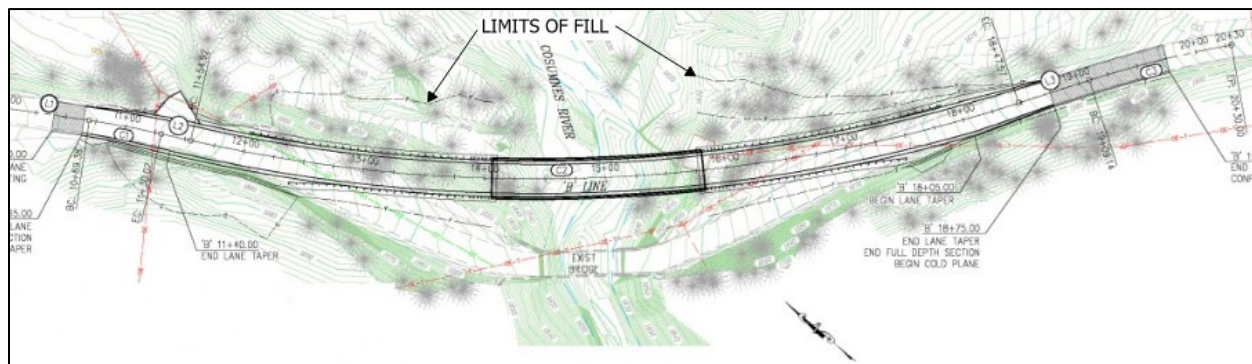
40-mph Alternative, No Retaining Walls, April 2015
